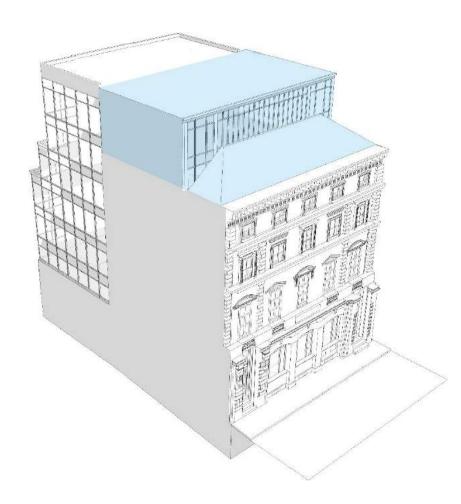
Existing pitch roof retained at front, with a two storey new build extension set back from ridge, reducing overall height from previous proposals.
